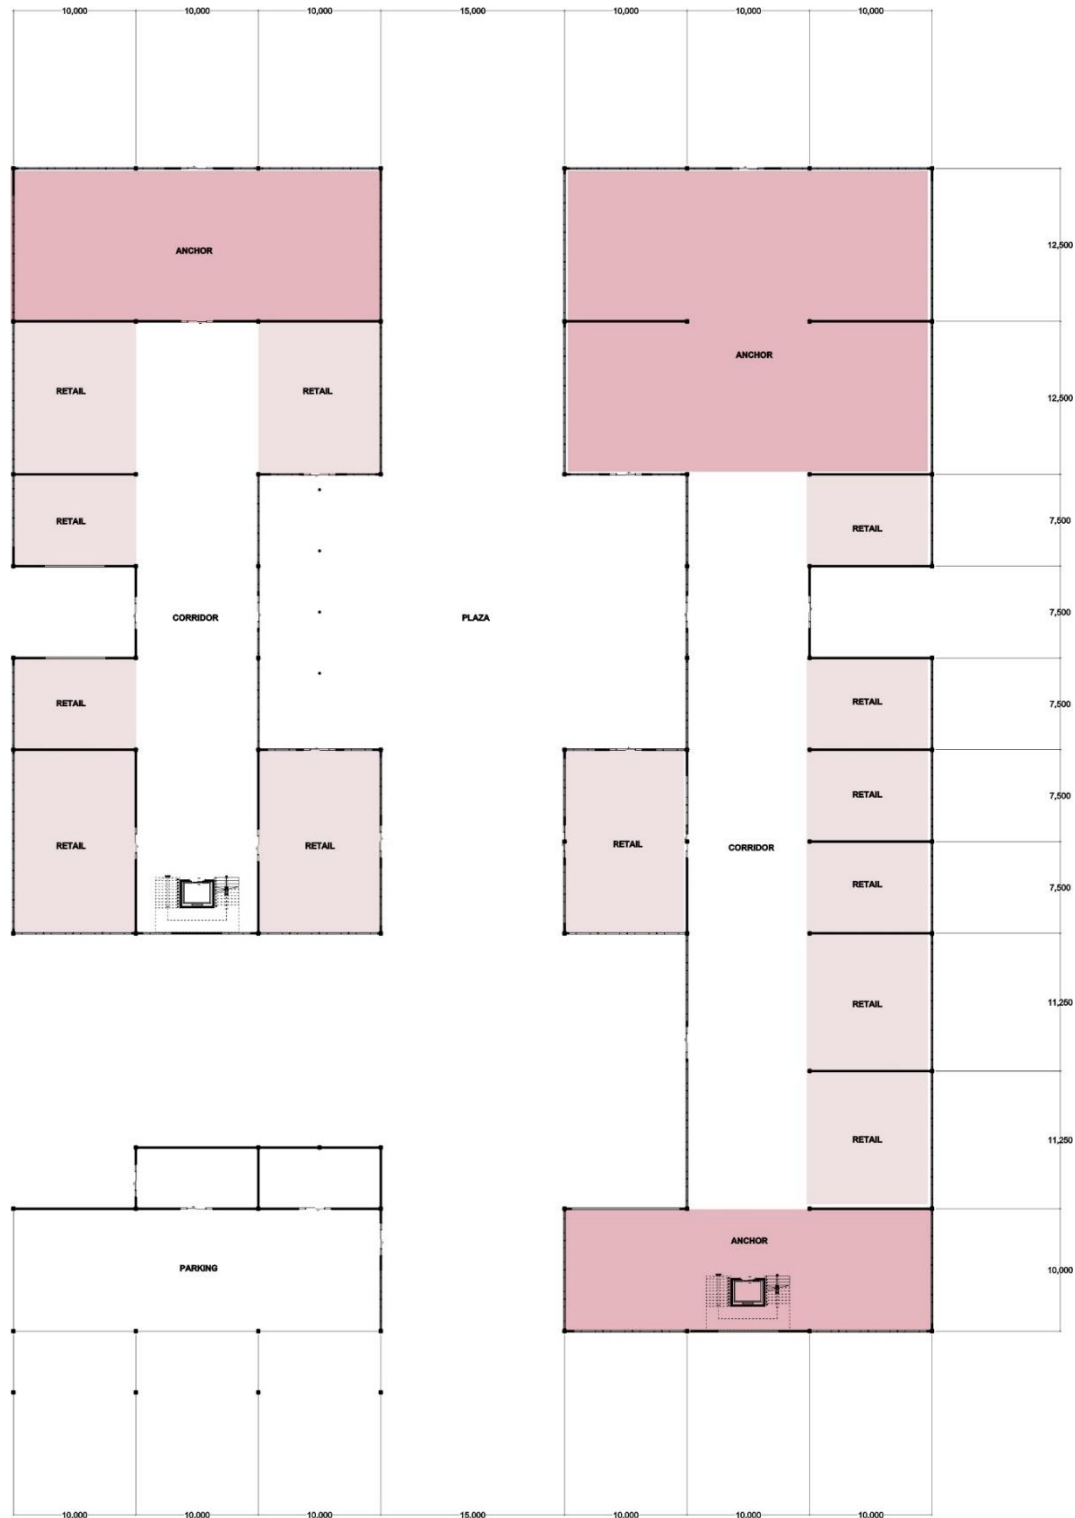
3 Schematic GF Plan Source: Author (2021)
